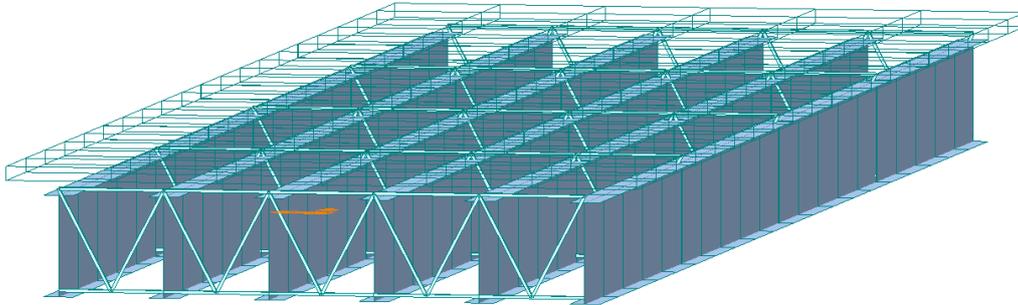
3D view of the steel composite girder bridge designed with proposed GDF formula
